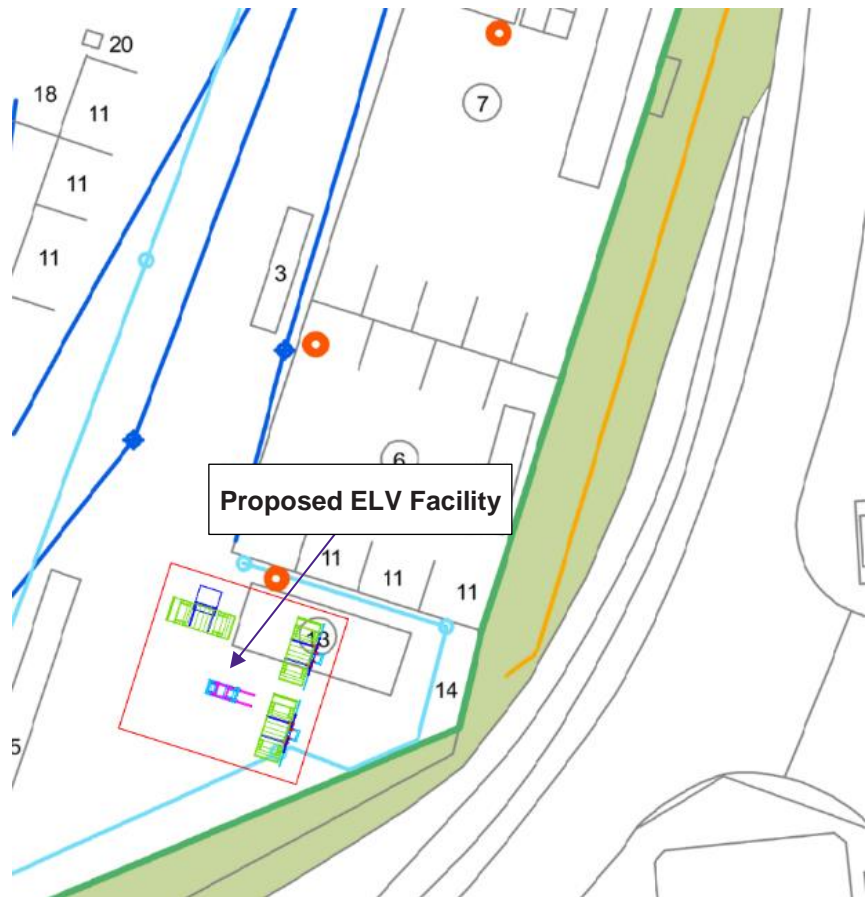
Site plan showing location of proposed ELV facility to south of main building
